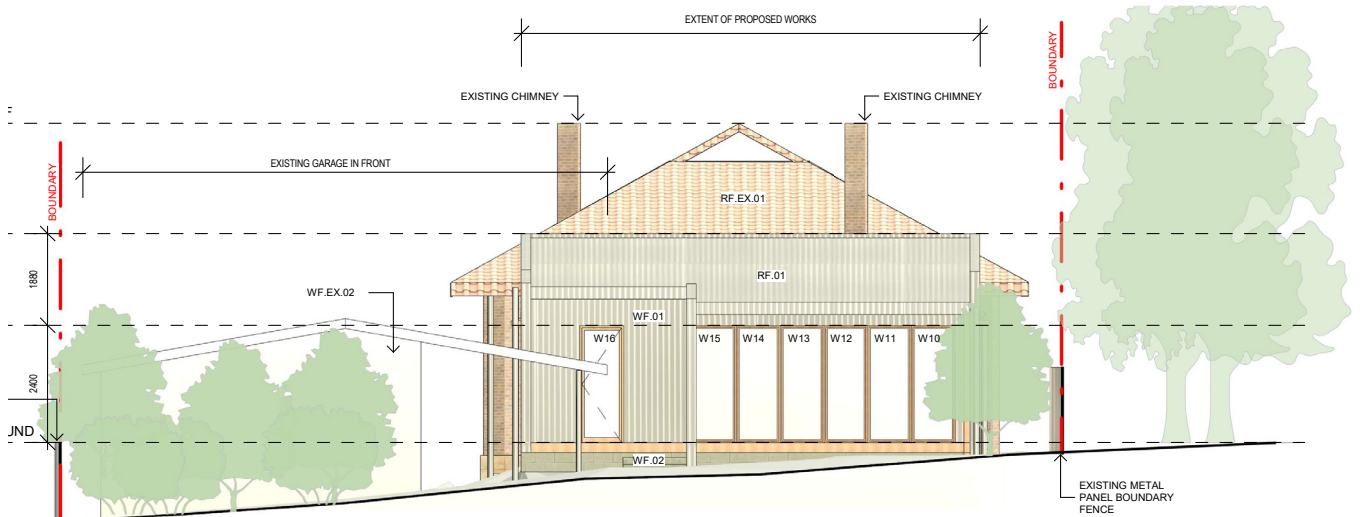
DA_301 South (Rear) Elevation - Proposed (LVA, 2025)
